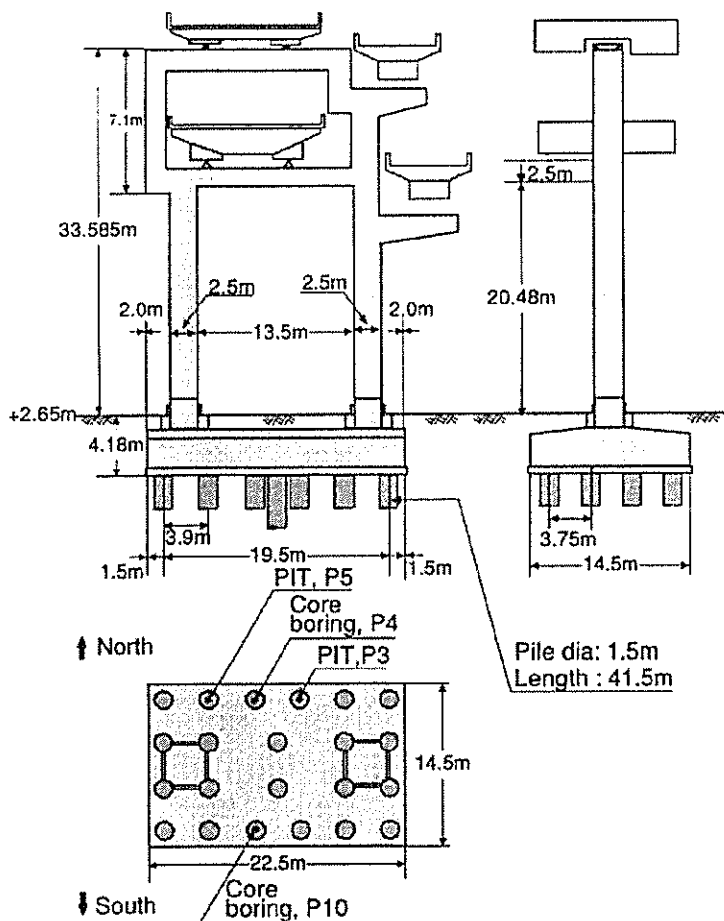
Plan and Side Views of Pier 211 (Hanshin Highway Authority, 1996).
